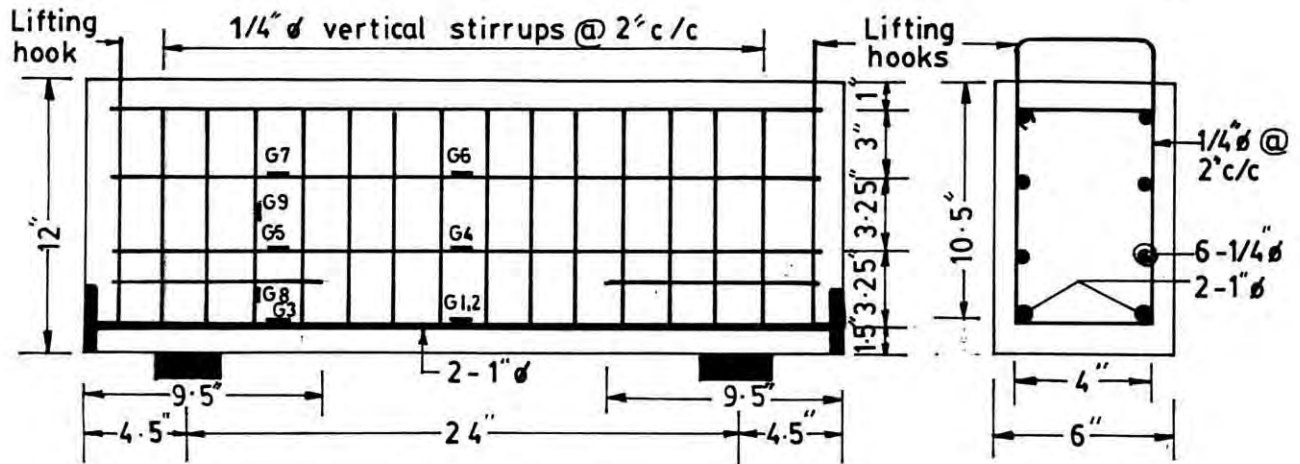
Reinforcement arrangement of beam DB-Q5
